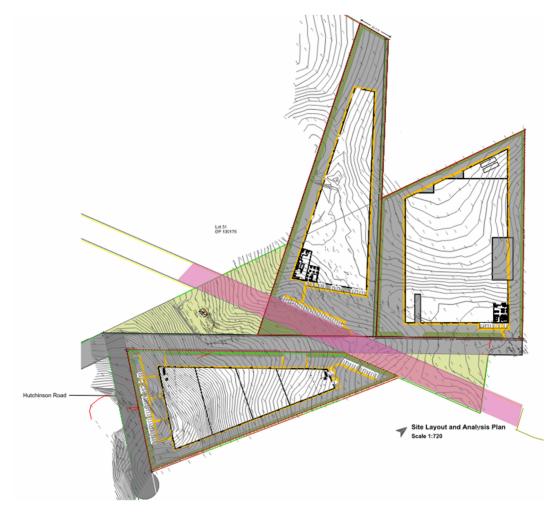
Proposed development site plan (Jackson Environment and Planning)
